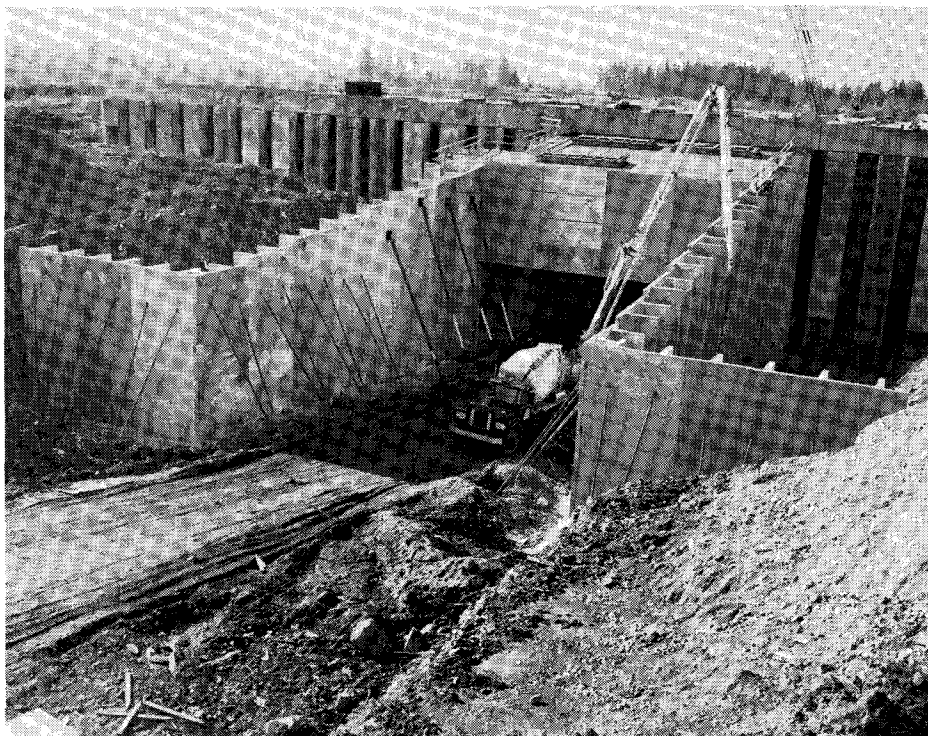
West entry showing precast concrete retaining walls [up to 35 ft (10.67 m)].
